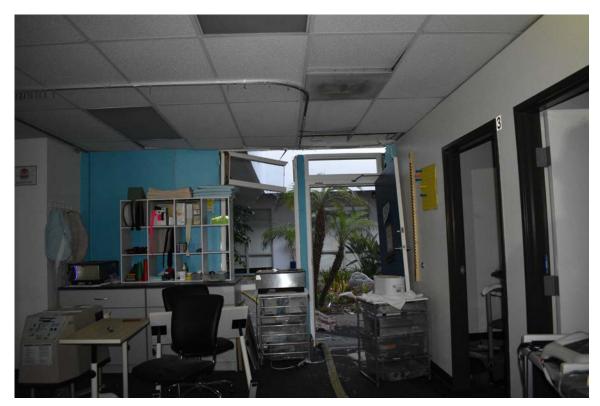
Access door to center courtyard. High level severe structural damage.
